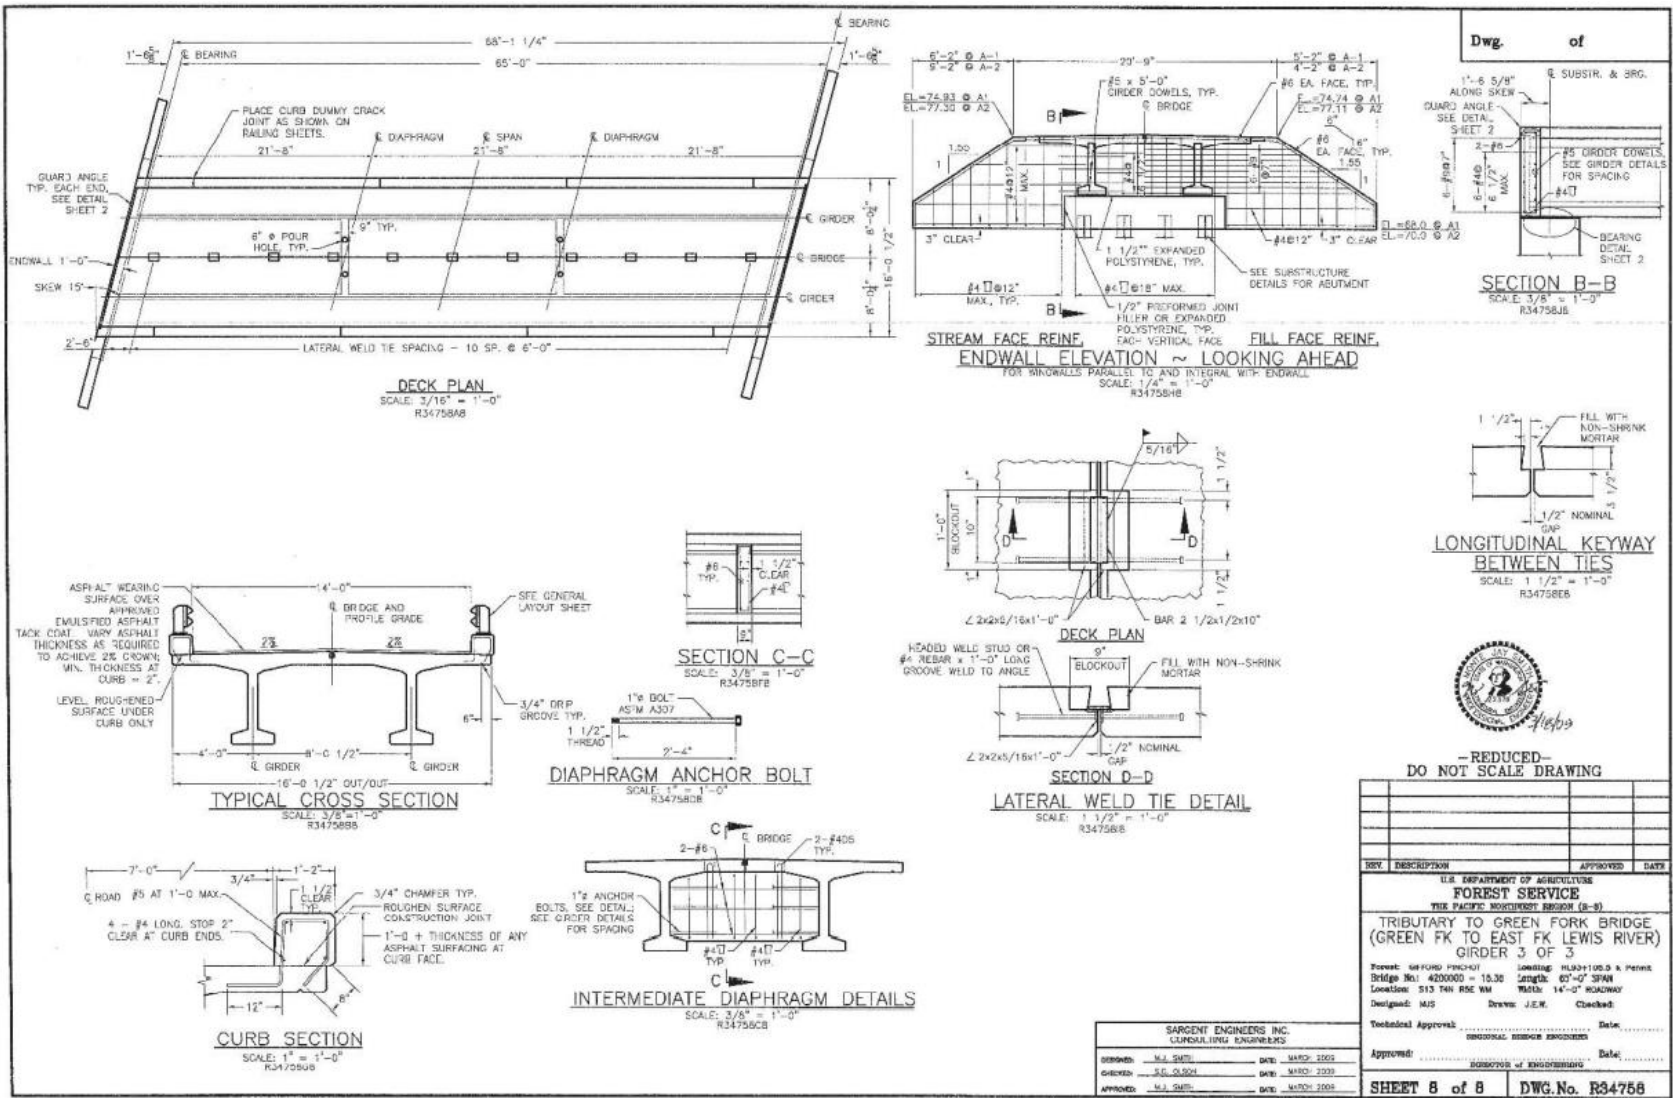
Bridge Deck Design Drawing for Gifford Pinchot National Forest, Girder 2 [8]
